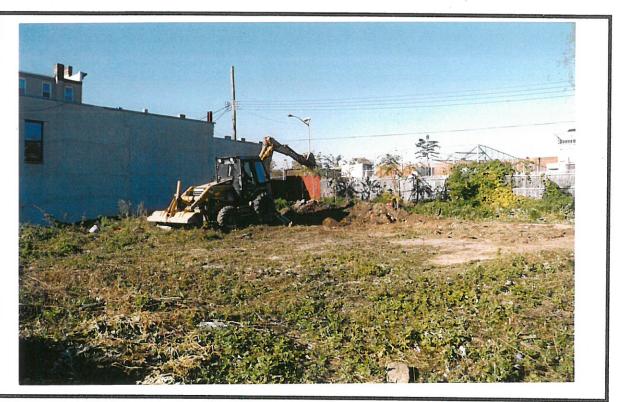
Backhoe excavating Trench 5 on Lot 12. View to northwest.
